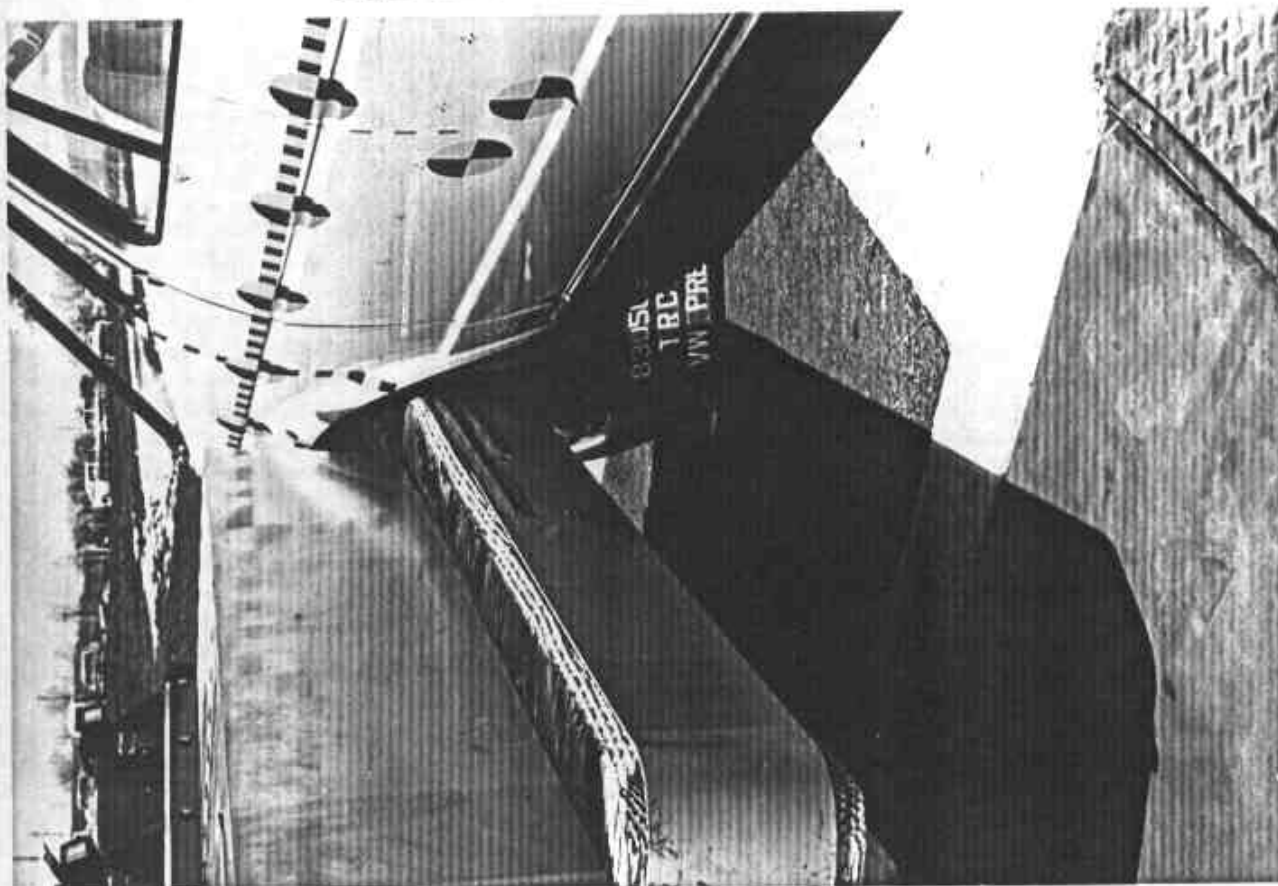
PRE-TEST CLOSEUP - VIEW 2
